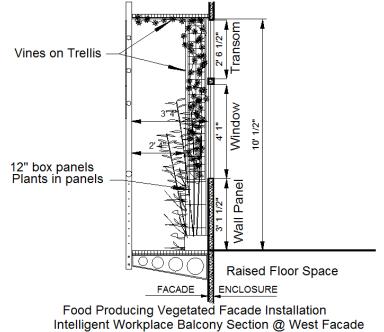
West Façade Research Bay Typical Wall Section, Leininger, 2012
